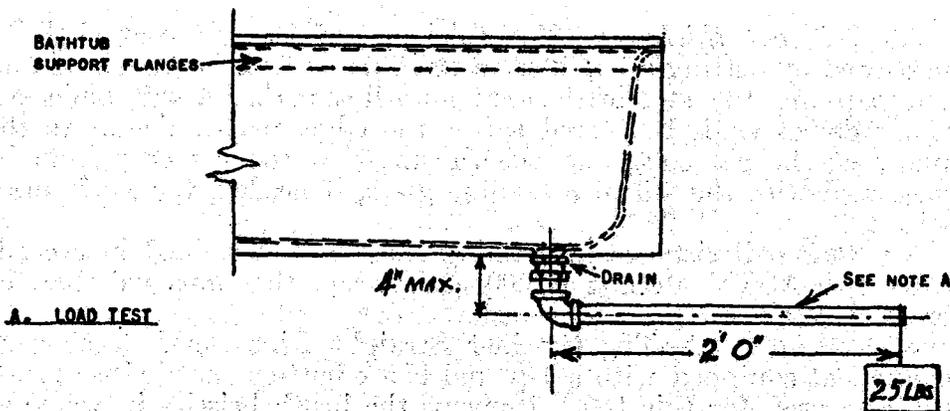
Test for Bathtub Drain Fitting Connection (par. 5.14).
